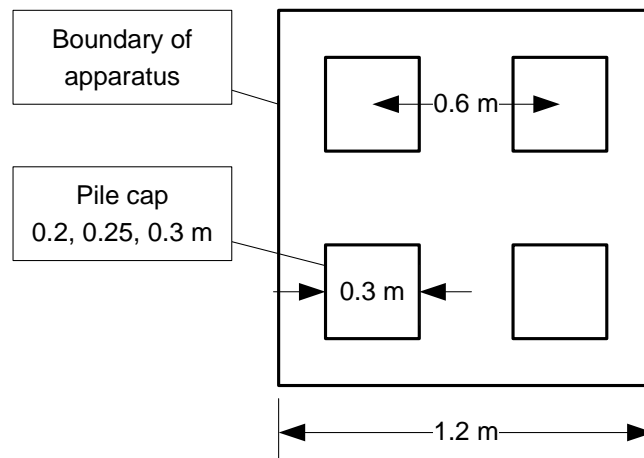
Plan view sketch of the apparatus used by Demerdash
